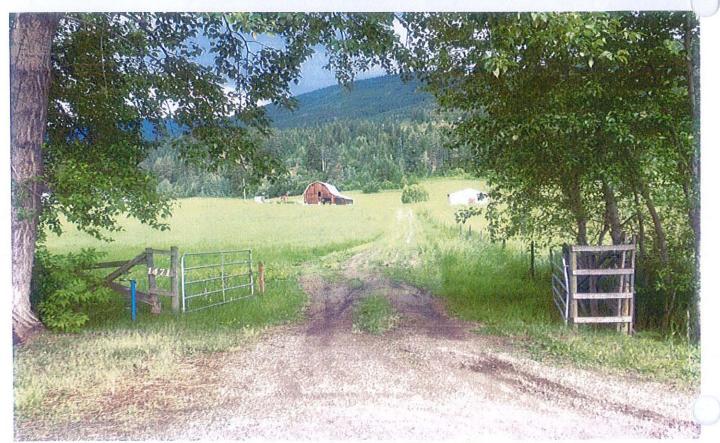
Photo looking west at the current and proposed access from 50 Street SW.
